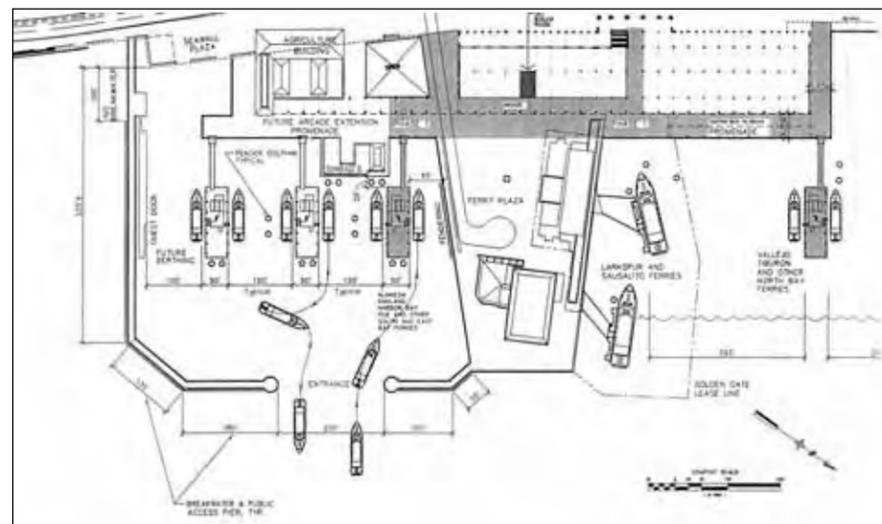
Pier 14 Extended Dual Arm Breakwater Option
